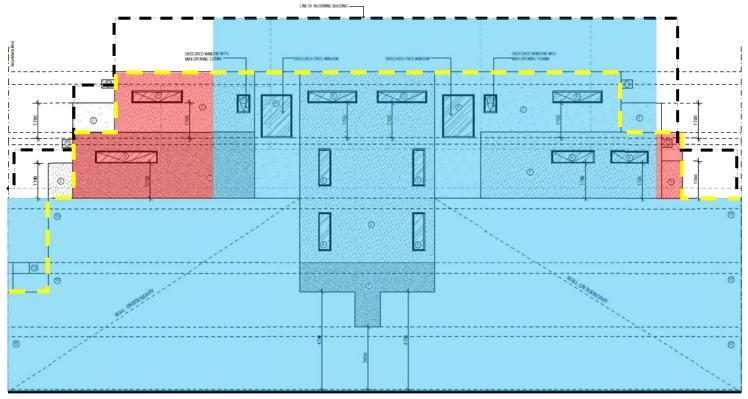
Notated excerpt from 'East Elevation Plan' prepared by NRG Building Designs Pty Ltd
